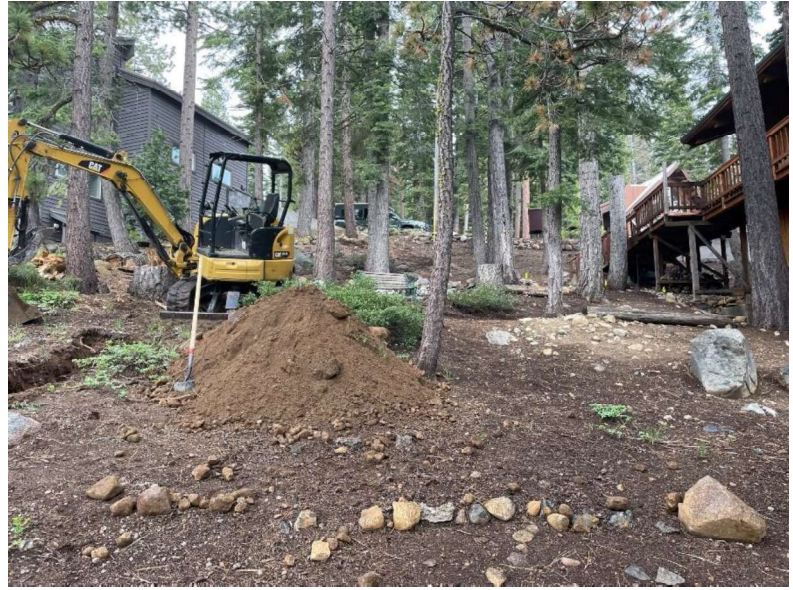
a. Soil pit. Photo 1- b. Looking north across pit towards Snowshoe Road.
